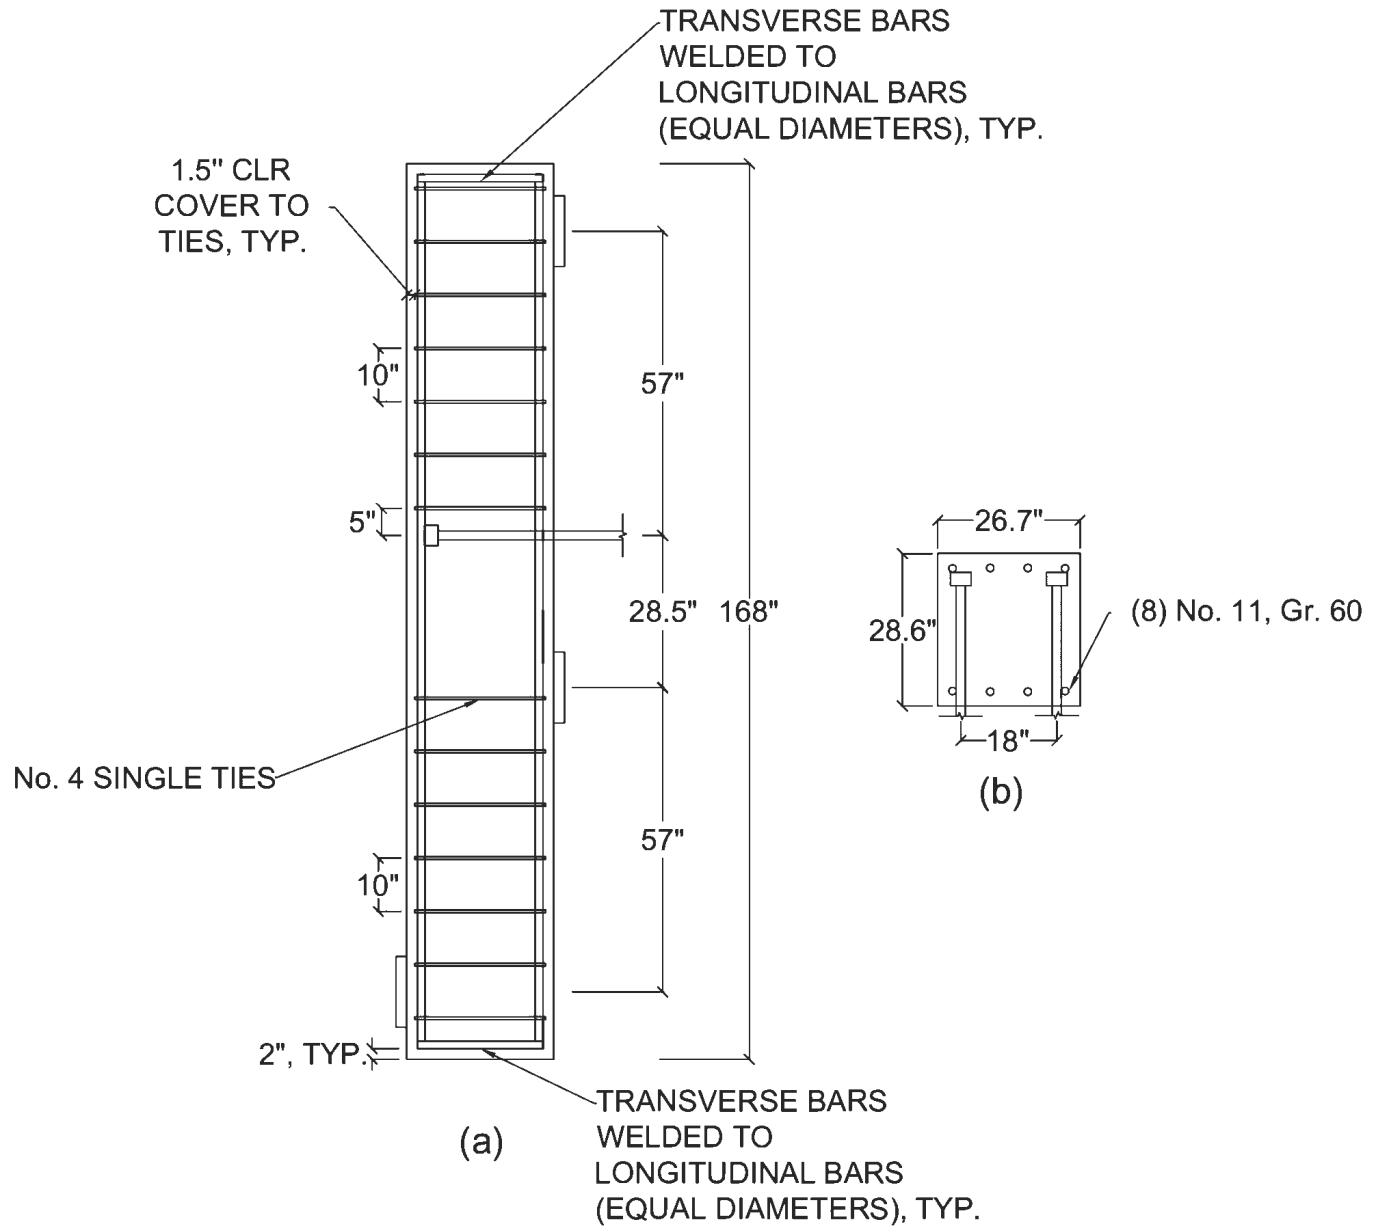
Details of reinforcement layout for No. 14 headed bar specimen 14-15: (a) elevation, (b) cross-section
